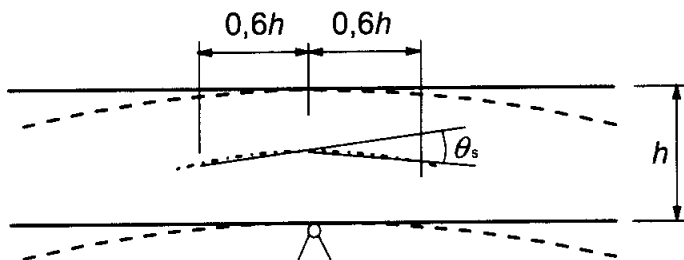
Plastic rotation θ_s of reinforced concrete sections for continuous beams and continuous one way spanning slabs.
